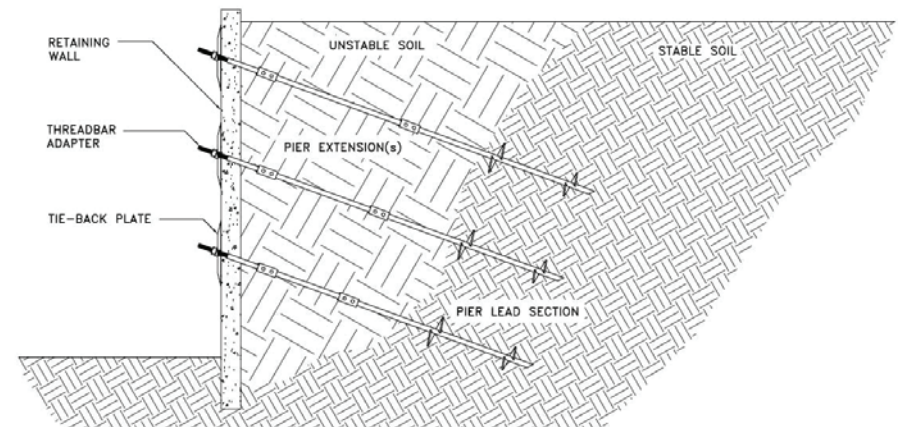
Retaining walls with tie backs (photo by www.google.com)
